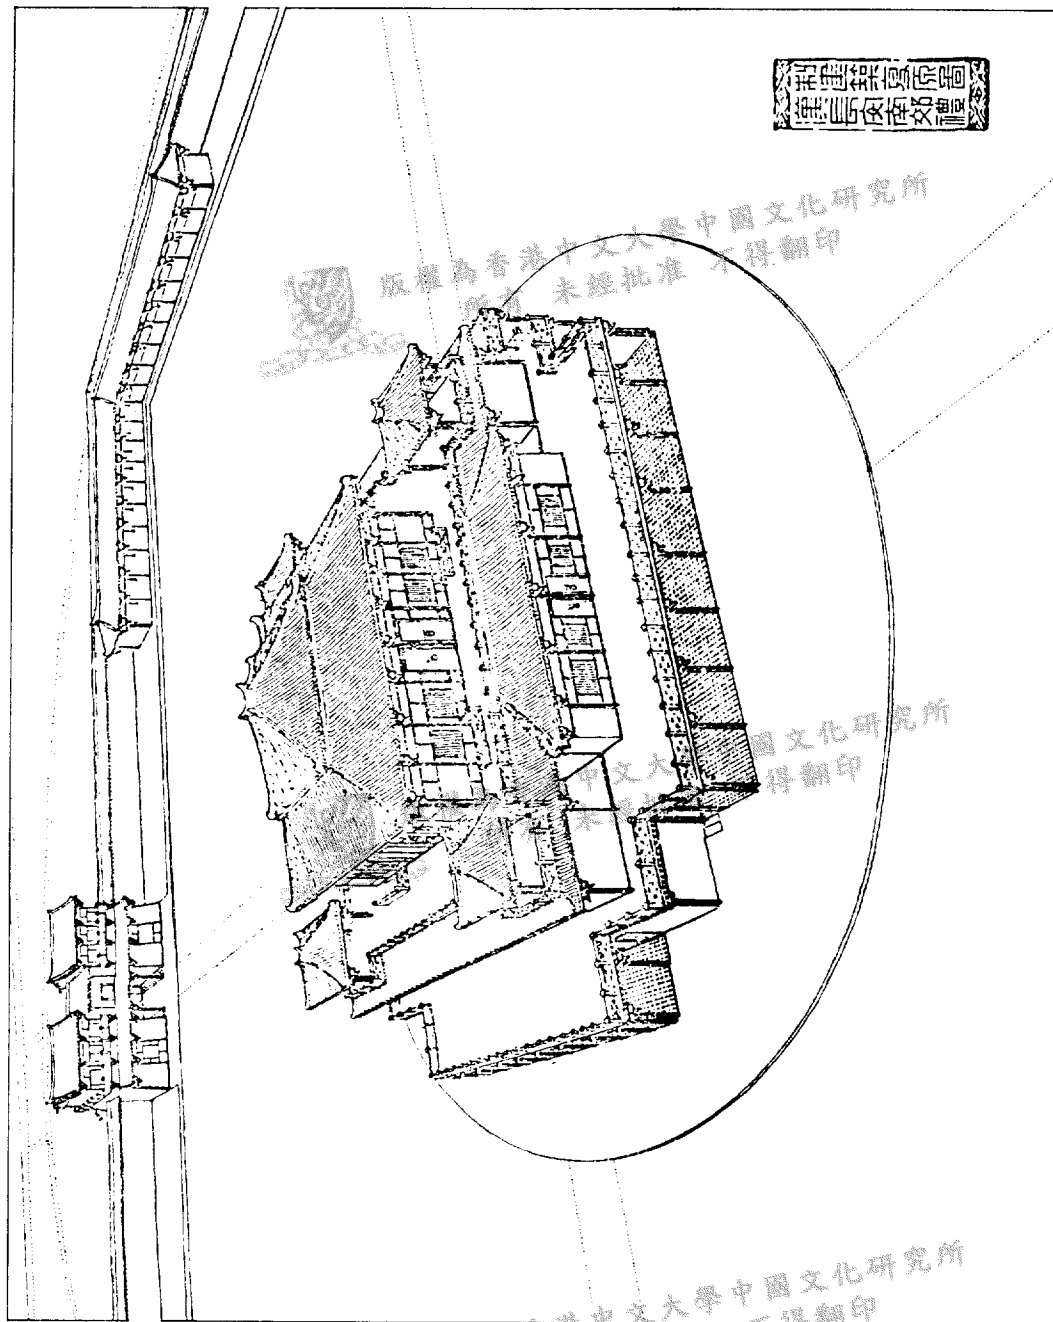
Reconstruction of the central building of P'i-yung Palace — after KC, 63.9.514.
